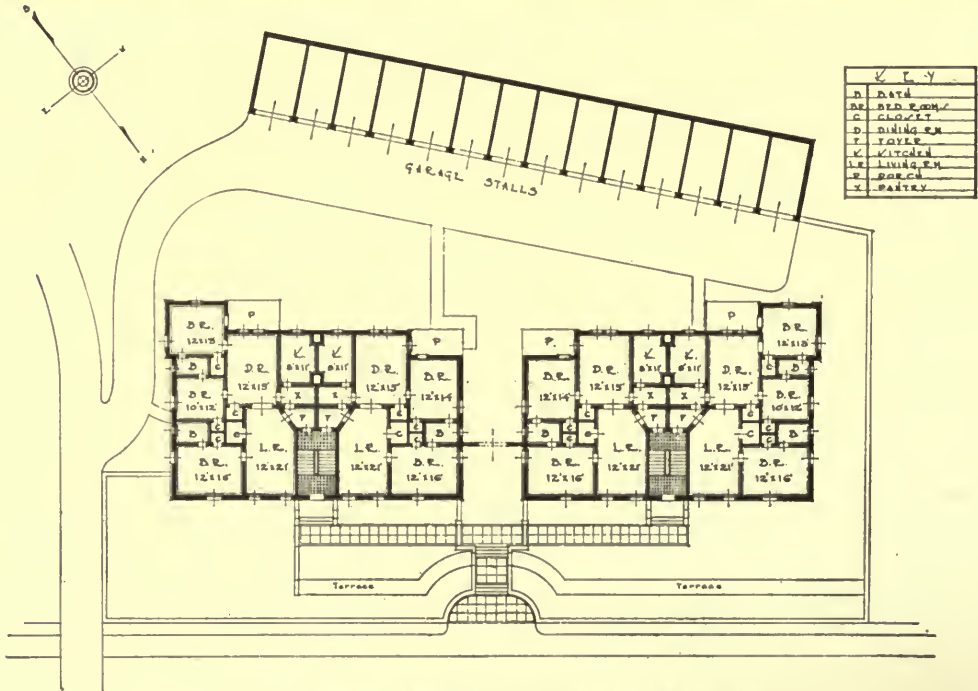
TYPICAL FLOOR PLANS—NOS. 6 AND 12 SCOTT STREET, CHICAGO, ILL. WILLIAM ERNEST WALKER, ARCHITECT.
